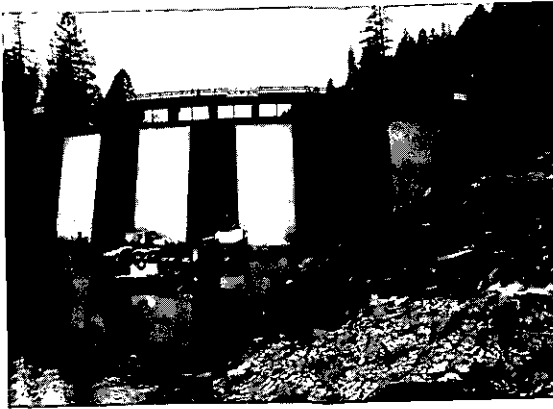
The panels of waterproofing geocomposite were staggered to allow dry and underwater installation to proceed at separate locations, assuring safety of workers and divers. A piezometer conduit was anchored to the dam face along one of the panels. Water levels within the drainage layer can be measured from the bridge deck with a level indicator lowered down the conduit
